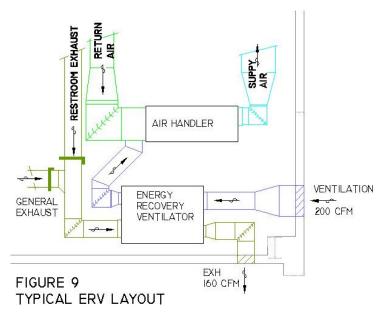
shows a typical layout with an ERV tempering the ventilation air for a zone air handler. Ventilation air is induced from outside by the ERV ventilation blower. The zone exhaust, after passing over the ERV enthalpy wheel, is exhausted to outside by the ERV exhaust blower. The ERV in the system shown is larger than the air handler, and this is often the case. ERV's are large, and the designer must
